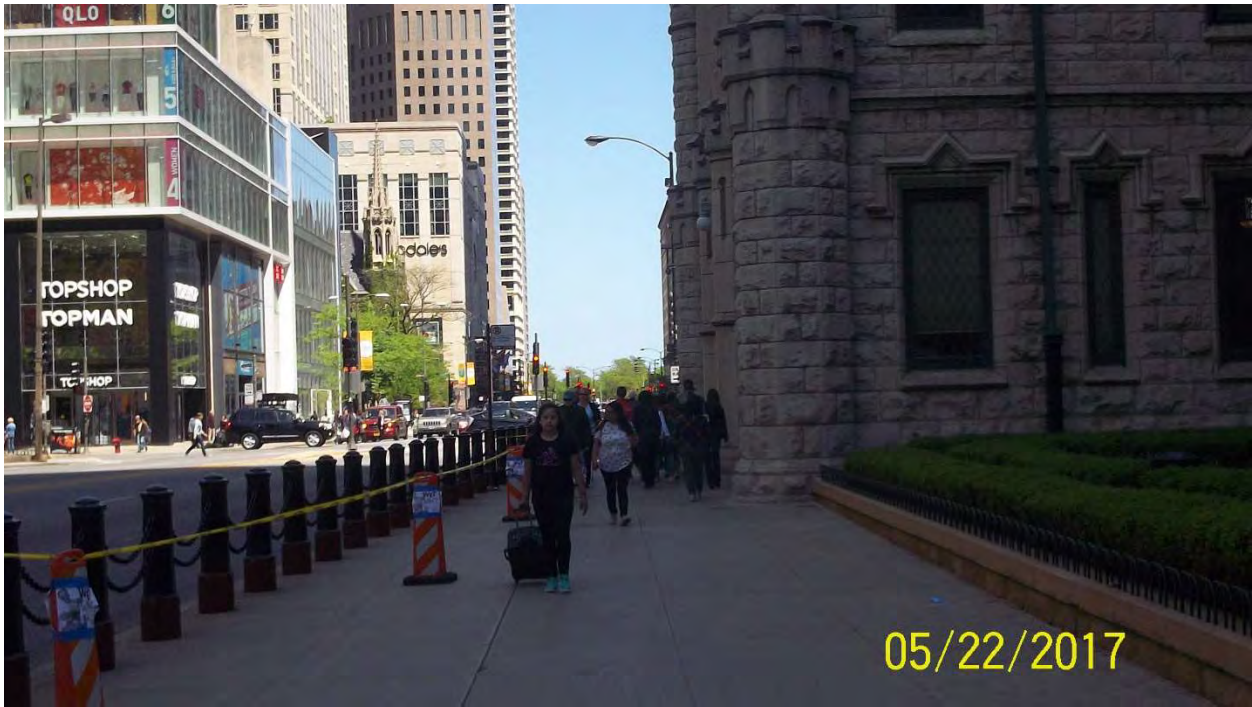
Northeast corner of Chicago Ave. / Michigan Ave. – Looking North
